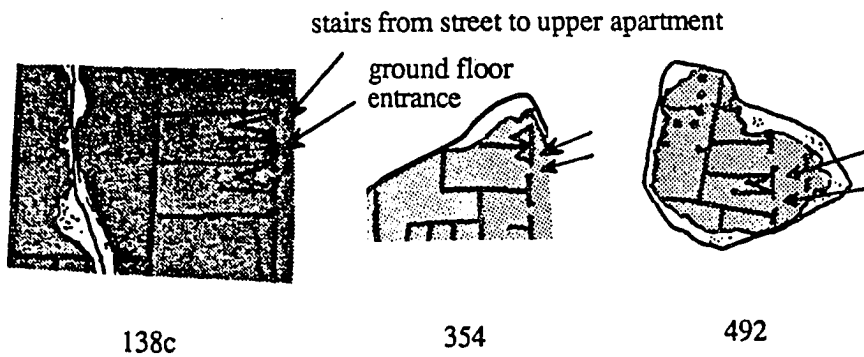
The "strip house," a narrow plan in which a street-front staircase provides separate access to upper-class apartments above the shop-dwelling on the ground floor, which has a court or larger rooms behind a corridor passing the staircase. A--the Roman strip house at the *Semita dei Cippi*, at Ostia (Boethius 1960). B--strip houses appearing on the Marble Plan (FUM). This form has persisted into twentieth-century Italy as well.
